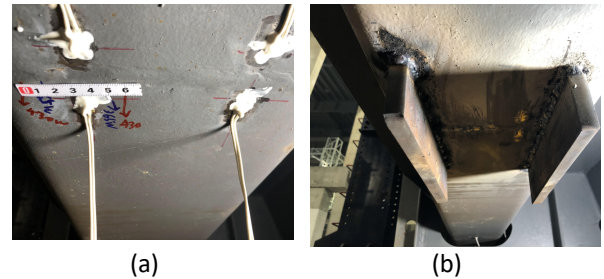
U-rib butt-welded connection: (a) fatigue crack along the weld; (b) repairing and stiffening scheme.
